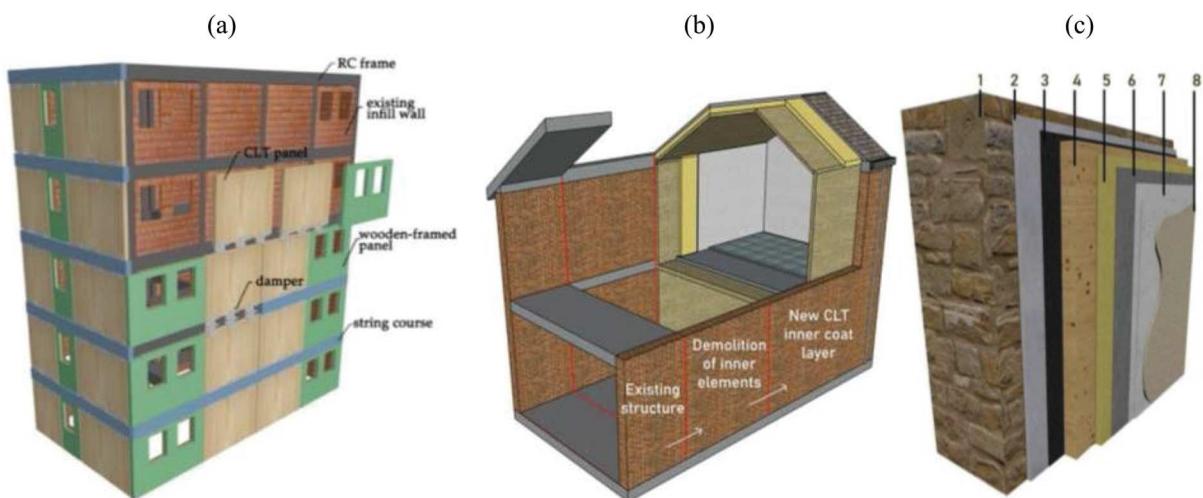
(a) CLT panels used as external reinforcement in RC frames [76] - CC BY 4.0; (b) Nested Building retrofitting strategy; (c) Layers of retrofit with CLT timber and thermal insulation attached to the masonry wall [80] - CC BY 4.0.
